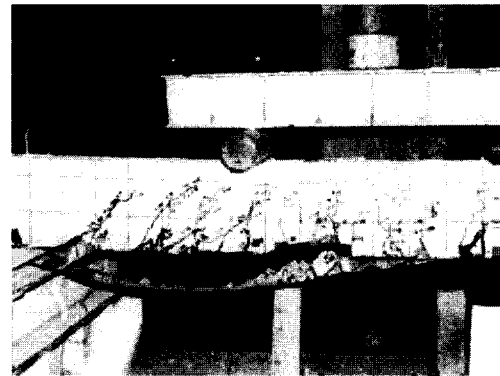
Interfacial shear failure of concrete in Beam CF3
